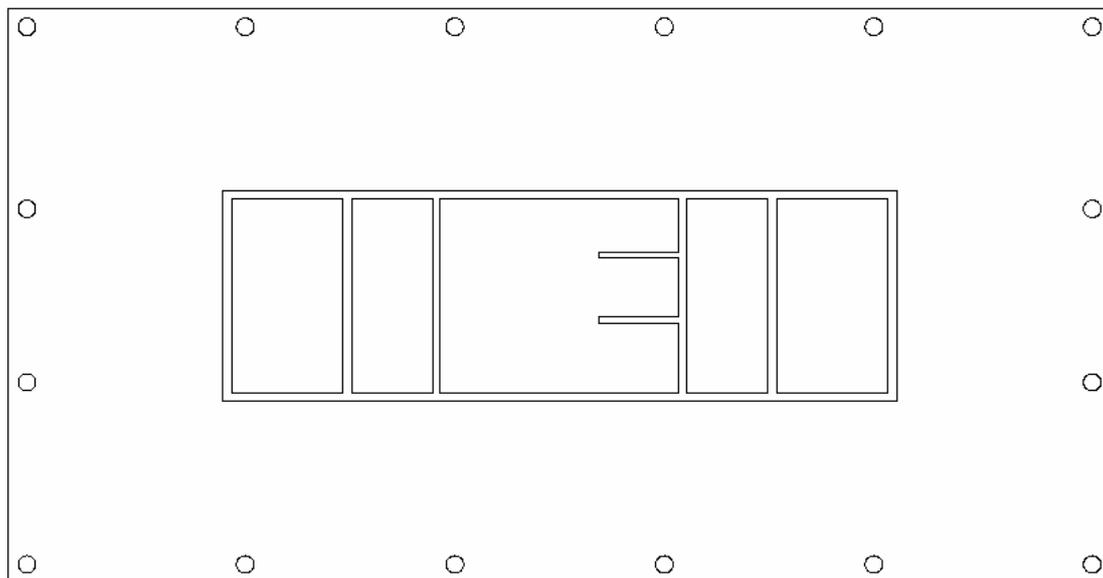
Shows one of many schematic figure of a floor in Smáratorg Tower, used to find the moment of inertia. This particular floor rises between 12.95 m and 26.95 m. Note that the pillars were neglected when the moment of inertia was established.
